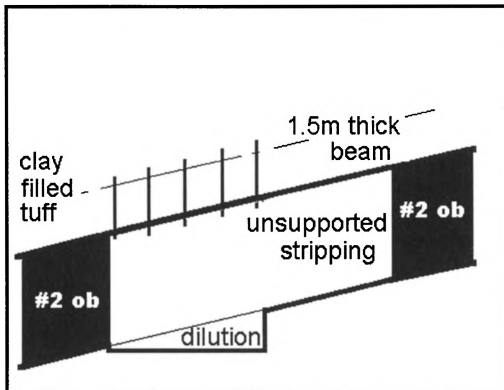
Diagram showing Two Orebody mining geometry, footwall dilution, and hangingwall rock beam plus bolting pattern.
